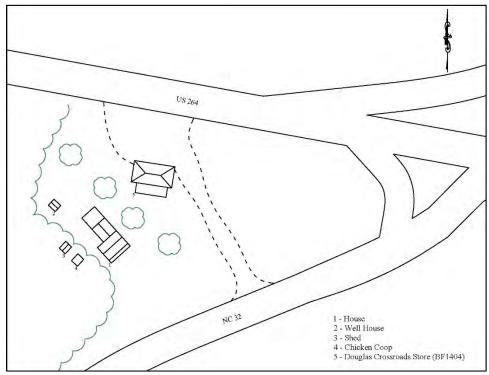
Site plan of the Jack Douglas House (BF1412).
